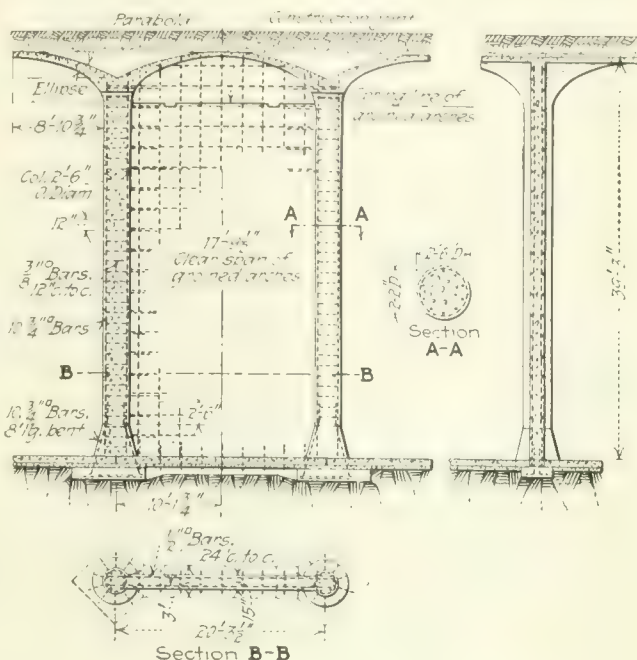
COLUMN AND ROOF ARCH DESIGN BALDWIN RESERVOIR
